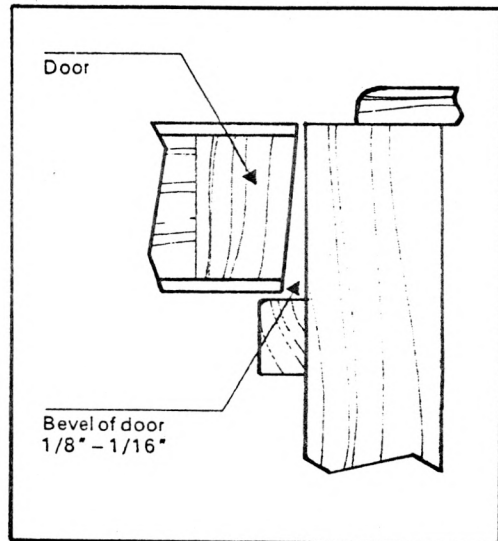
BEVEL LOCK EDGE OF DOOR
